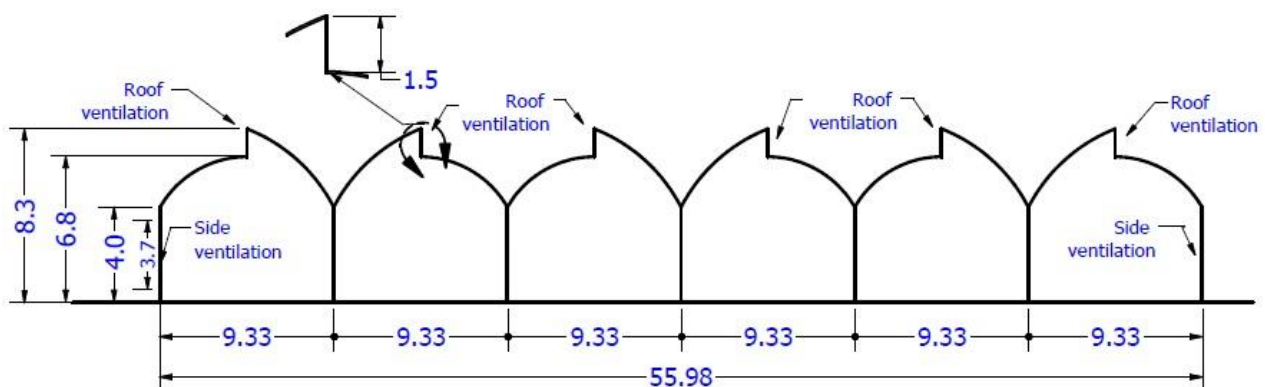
Geometric diagram of the cross section of the greenhouse studied.
